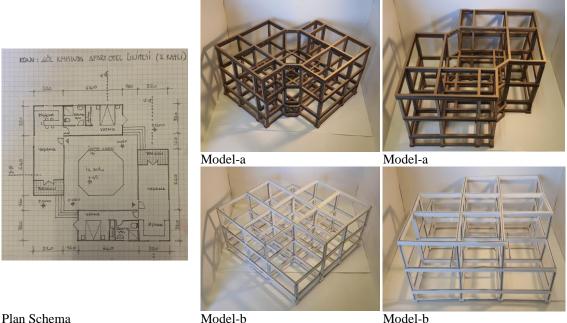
Reinforced Concrete Frame System Practice-6 Schema and Visuals of Student Model
